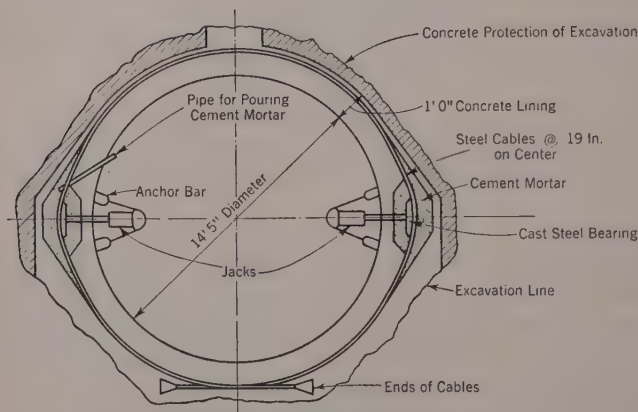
METHOD OF PRE-STRESSING A TUNNEL LINING
